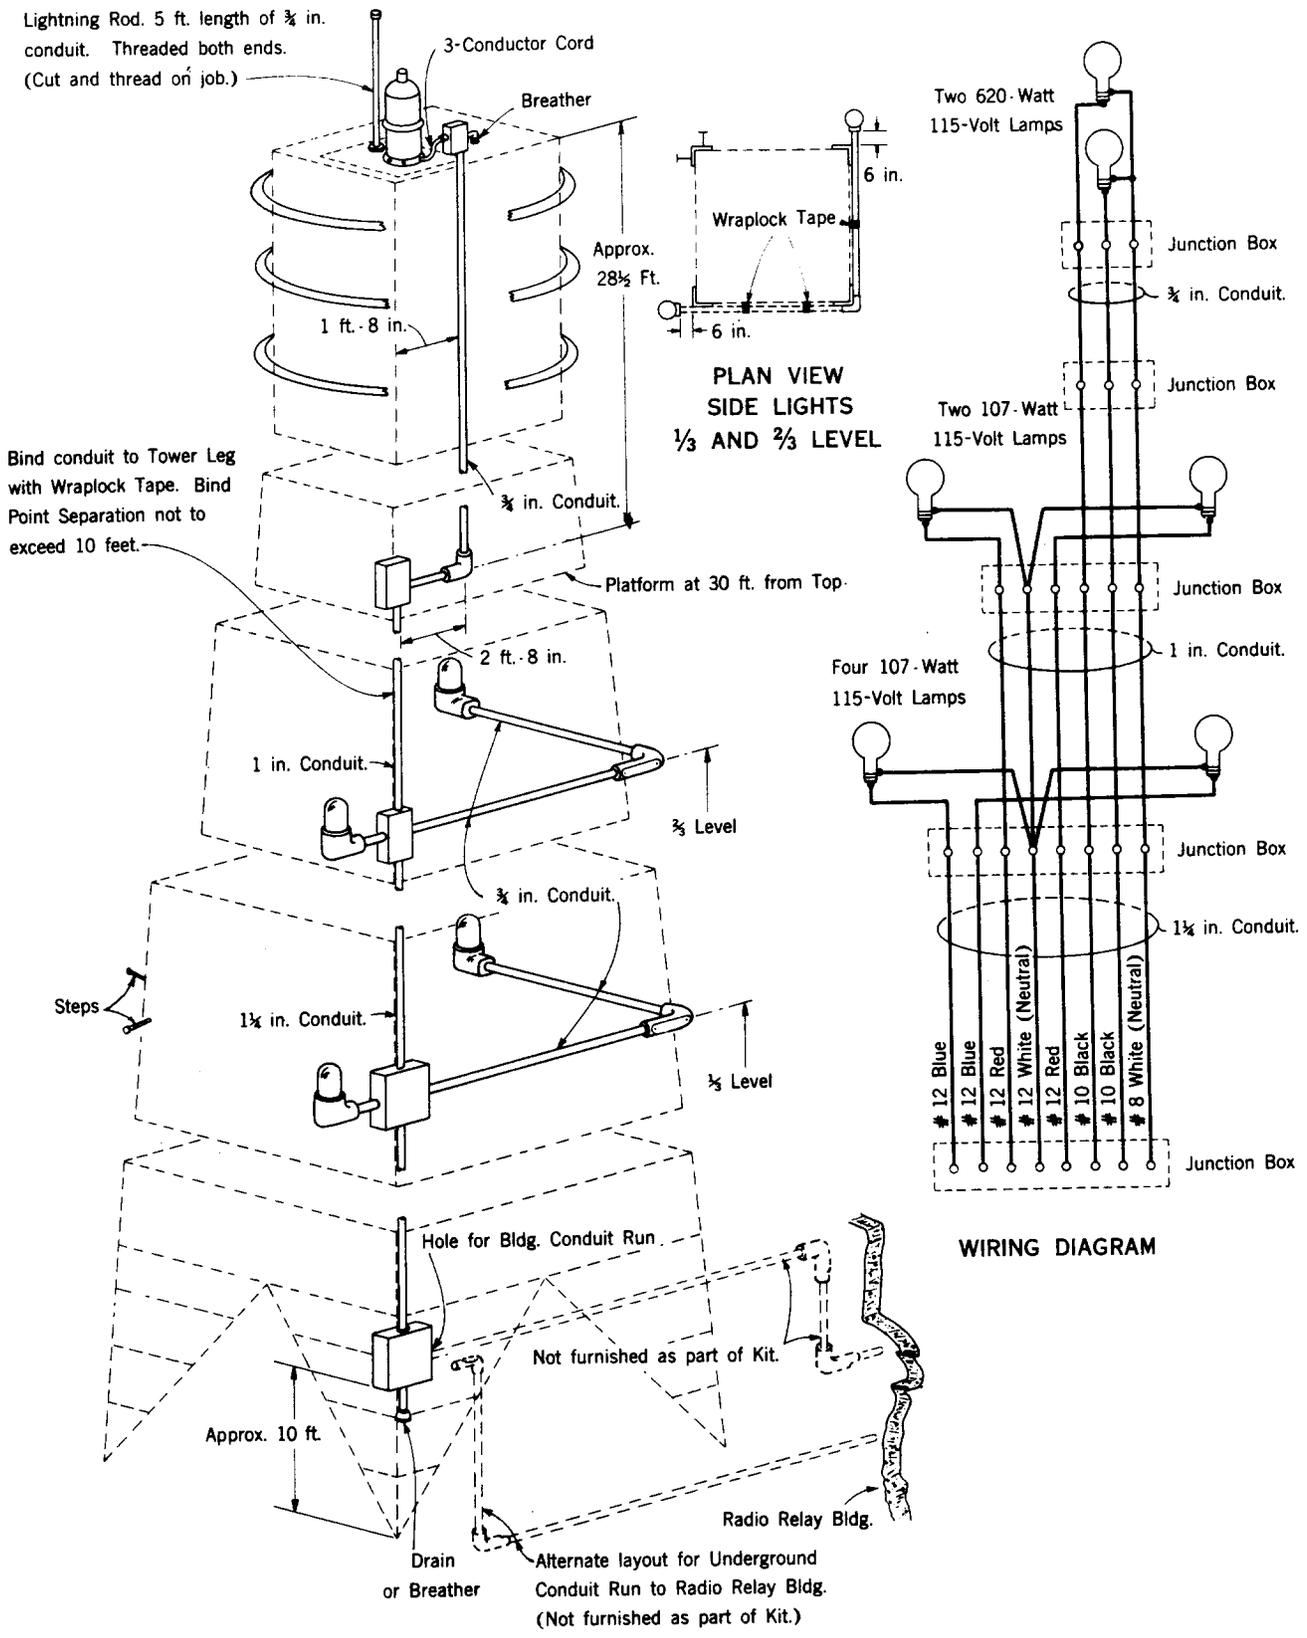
F.C.C. 17.26 Lighting - B Guyed Towers
